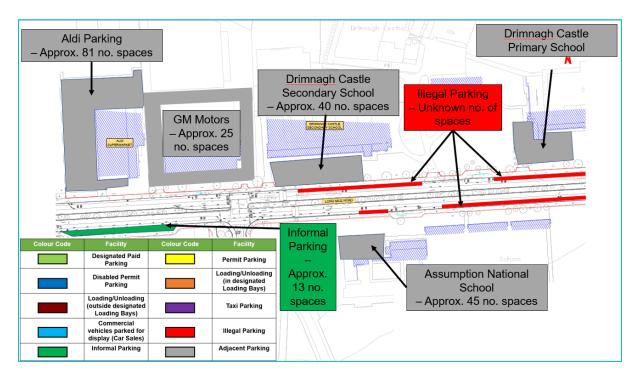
Long Mile Road between Walkinstown Avenue junction and Slievebloom Park Junction Parking Facilities Section 1
